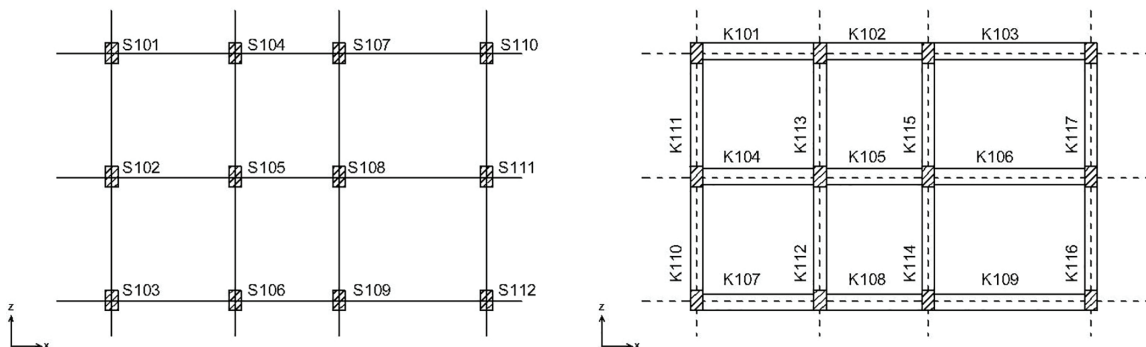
Column and beam layout plan of the 3-storey 3-span structure
